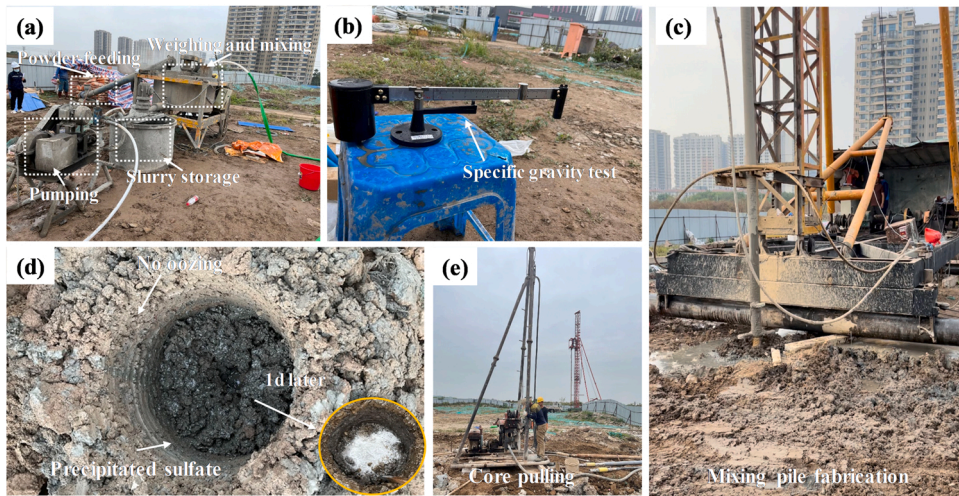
Construction process of solidifying agent application in deep mixing pile project: (a) pulping system, (b) specific gravity test, (c) deep mixing pile construction, (d) deep mixing pile completed construction and (e) pile core pulling.
